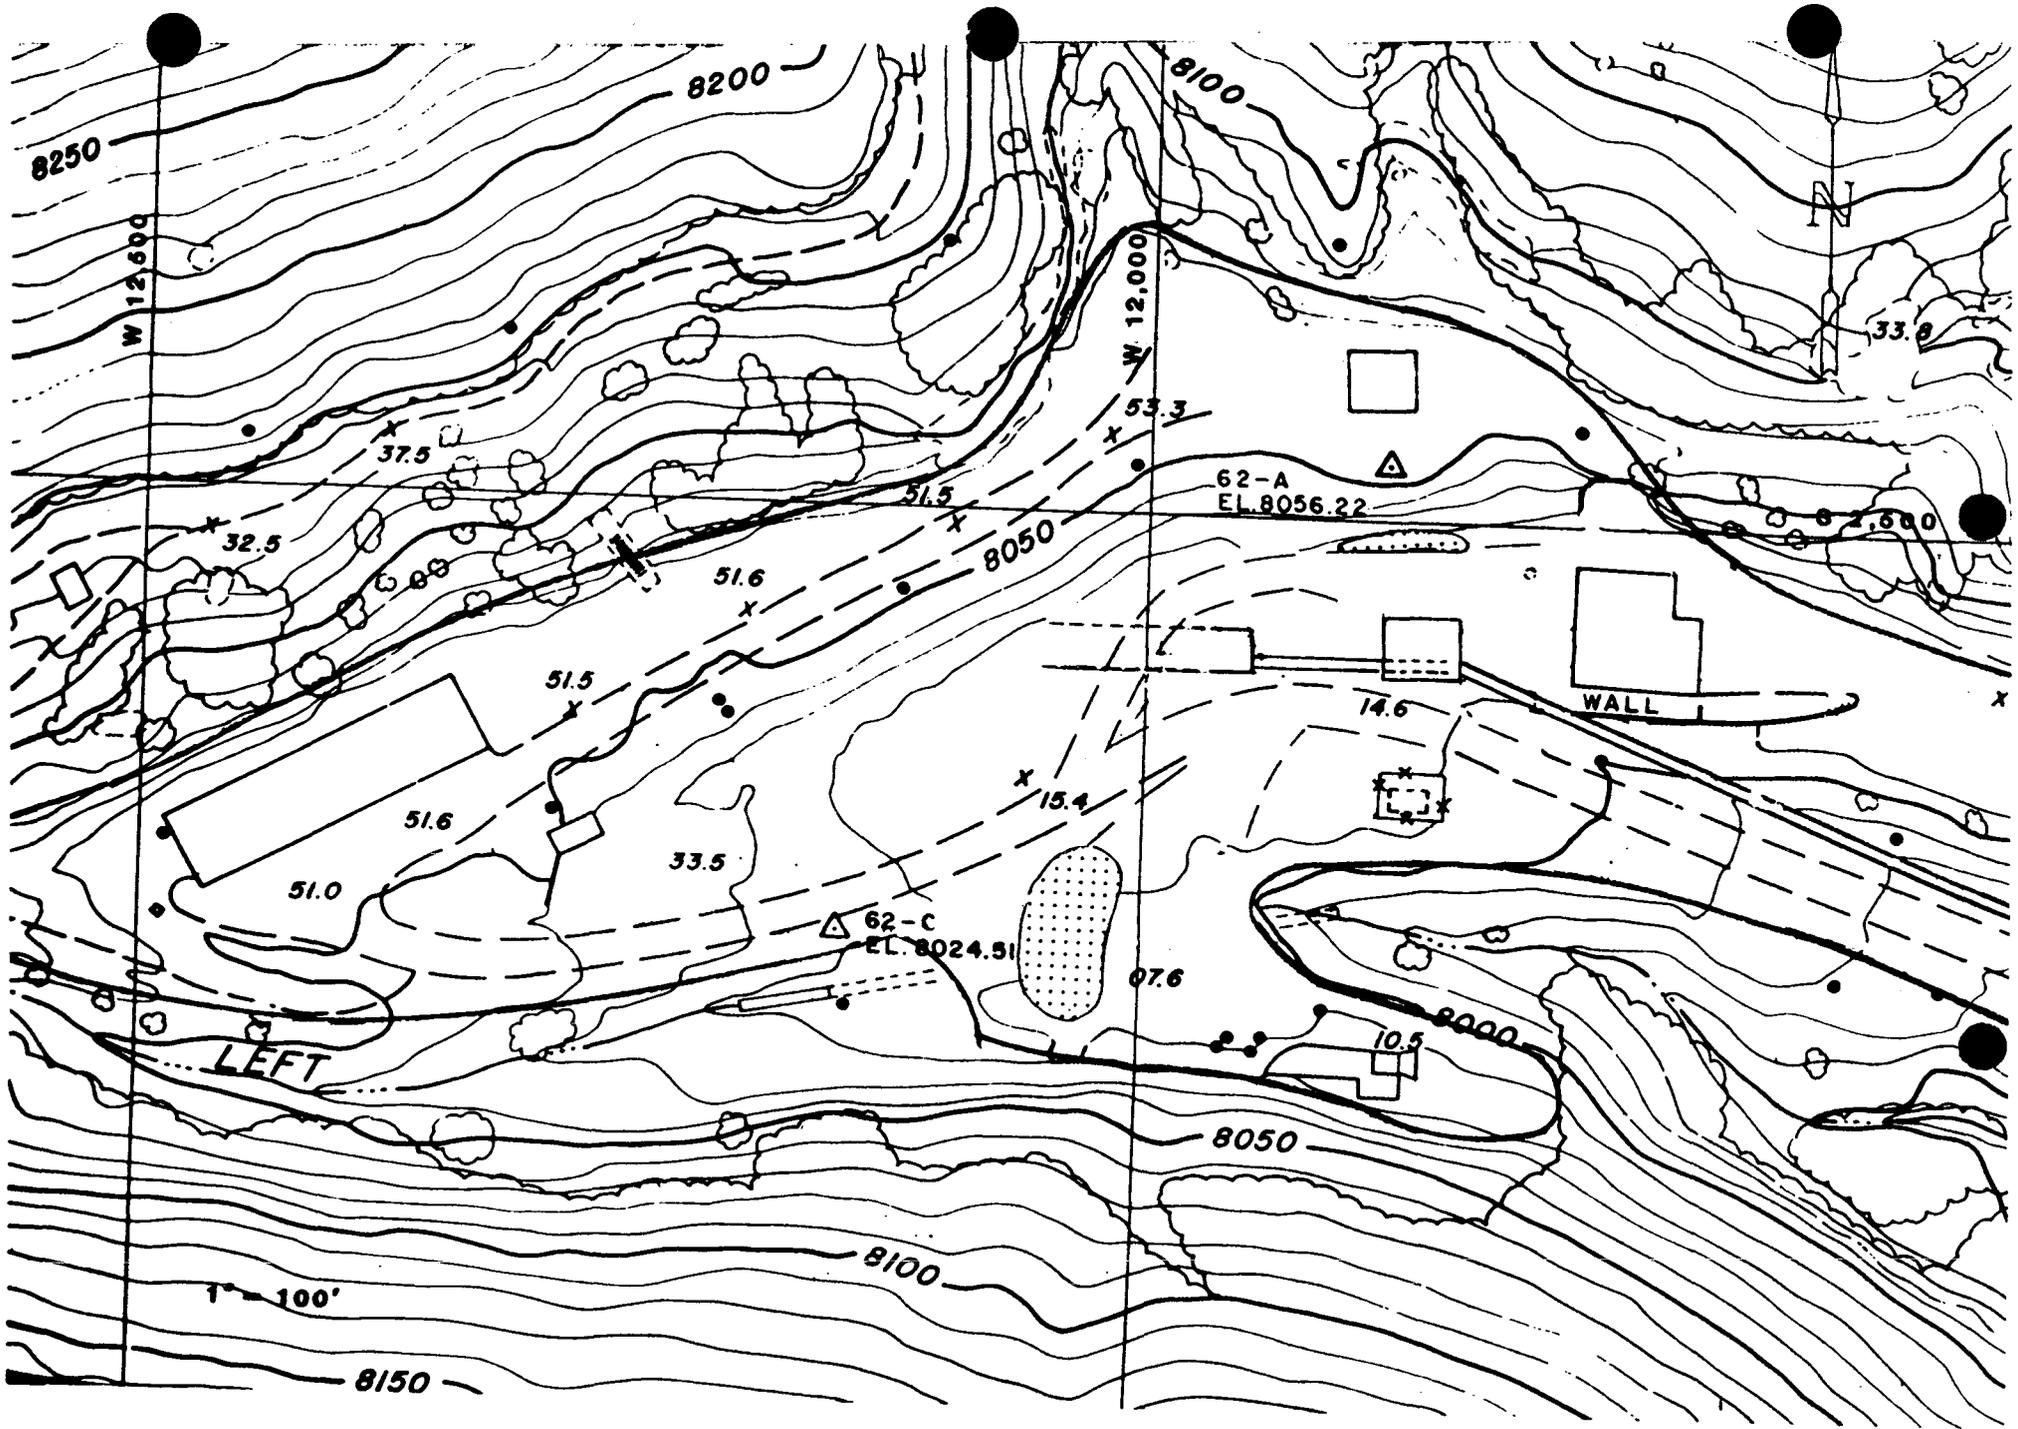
SOUTH FORK TEMPORARY UNDERGROUND DEVELOPMENT WASTE STORAGE SITES
